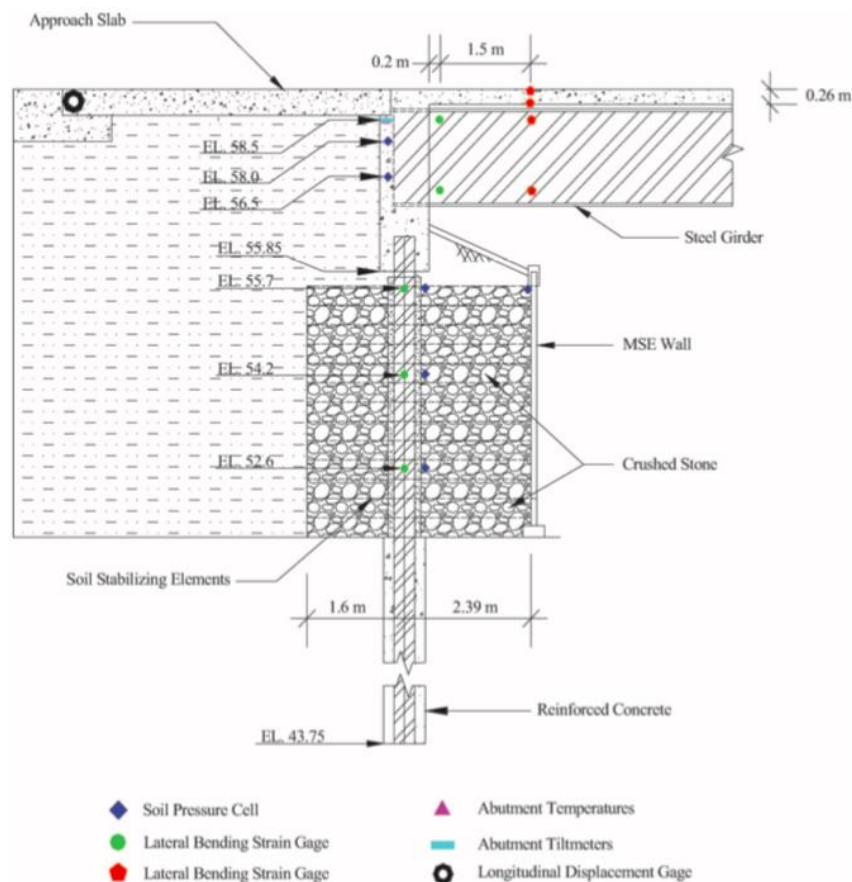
A schematic diagram of the cross-section elevation of the instrumented bridge. (Khodair & Hassiotis, 2013)
